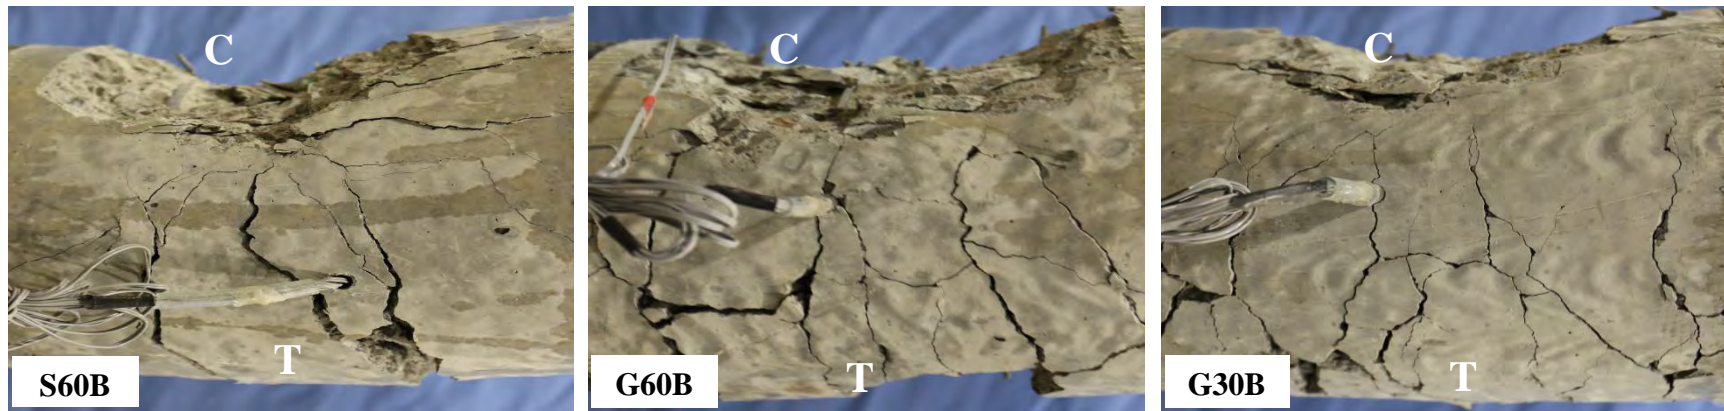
Failure modes of the beam specimens; C is the compression face and T is the tension face.
